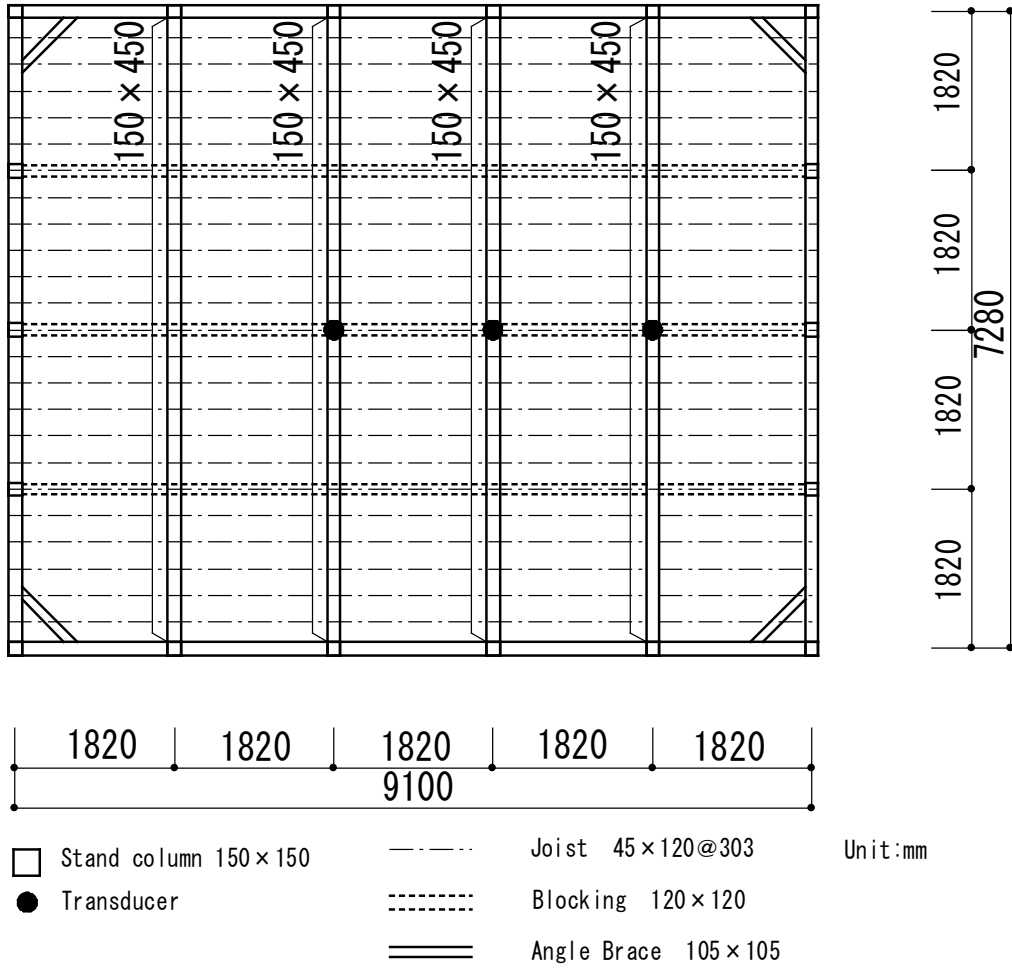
Upstairs floor framing plan of a measured room in elementary school B.
